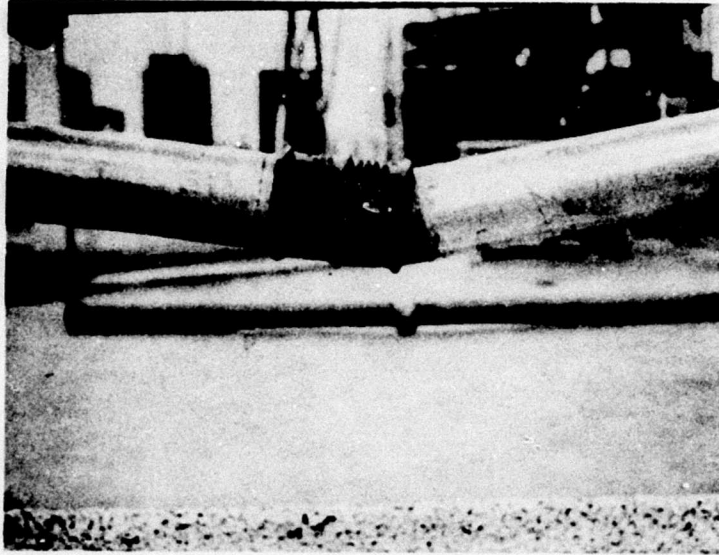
Side view of Skinner pipe clamp with sheet steel sleeve sample after lateral-stress test.
